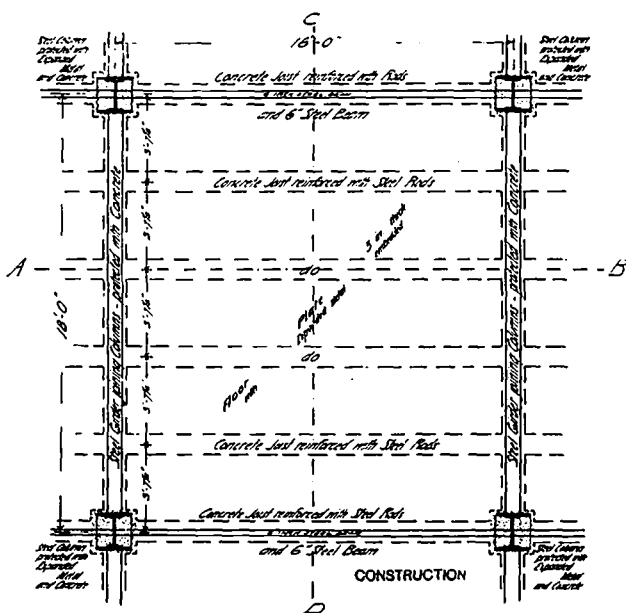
SECTIONAL DIAGRAM OF TYPICAL BAY, OGILVIE BUILDING, TORONTO, SHOWING END SECTIONS OF COLUMNS AND THE ARRANGEMENT OF CONCRETE JOISTS, STEEL GIRDERS, TIE BEAMS AND STEEL COLUMNS TO EFFECT A PERFECTLY SECURE SYSTEM OF FRAME WORK. FIGS. 14 AND 15 ARE DESIGNATED AS A-B AND C-D RESPECTIVELY.
